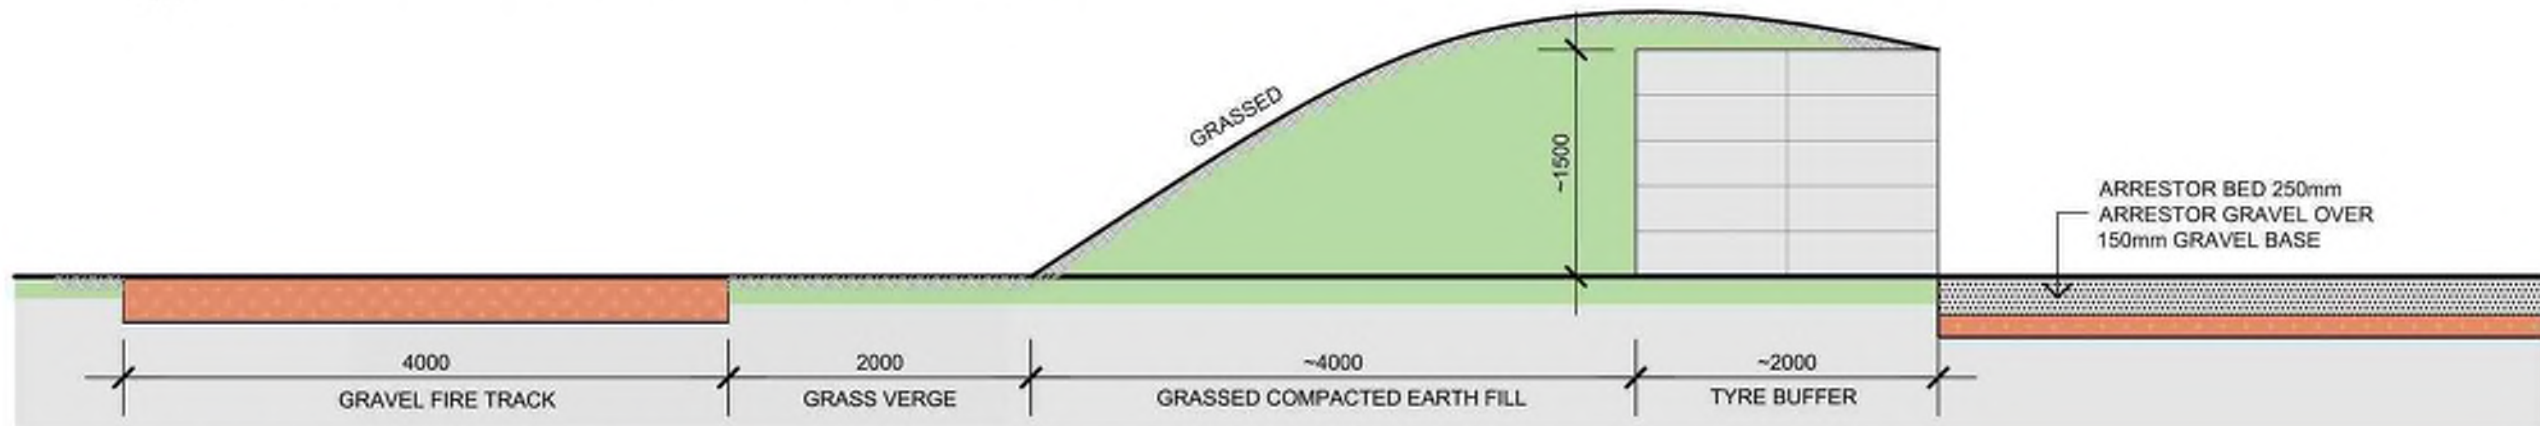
Proposed Southern Boundary treatment – earth backed tyre wall option
